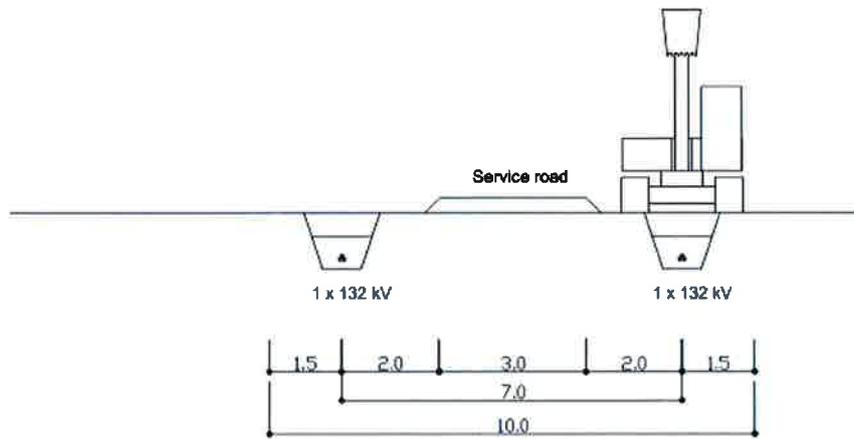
Minimum disturbance area for double set of 132 kV cables with service road between the two trenches. Excavated soil is removed from site.
